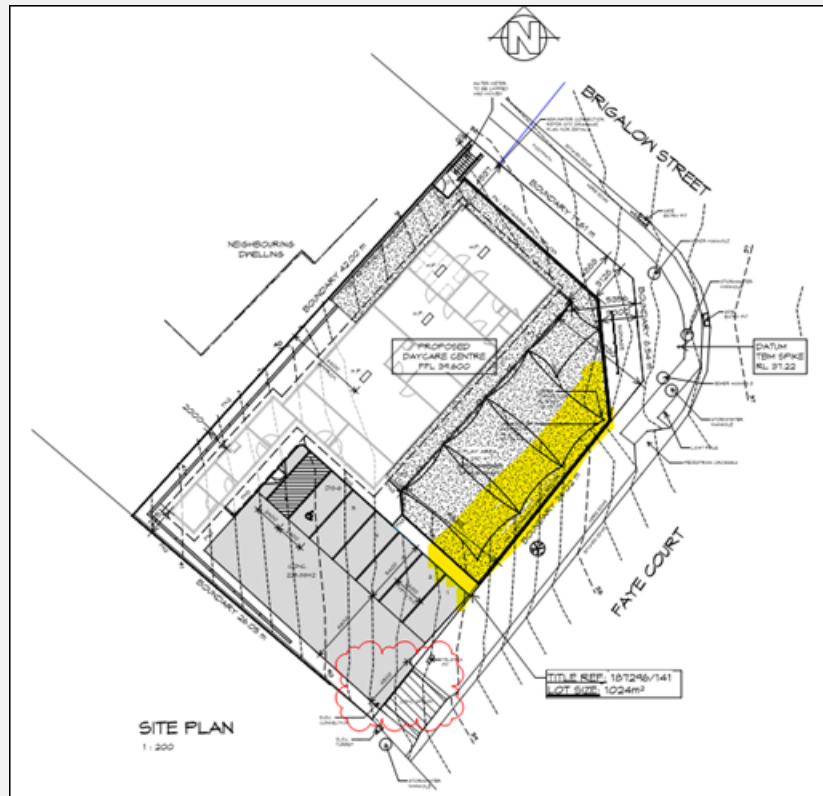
Extract from site plan with the front fence, retaining wall and shade-sails within the secondary frontage setback (highlighted)
